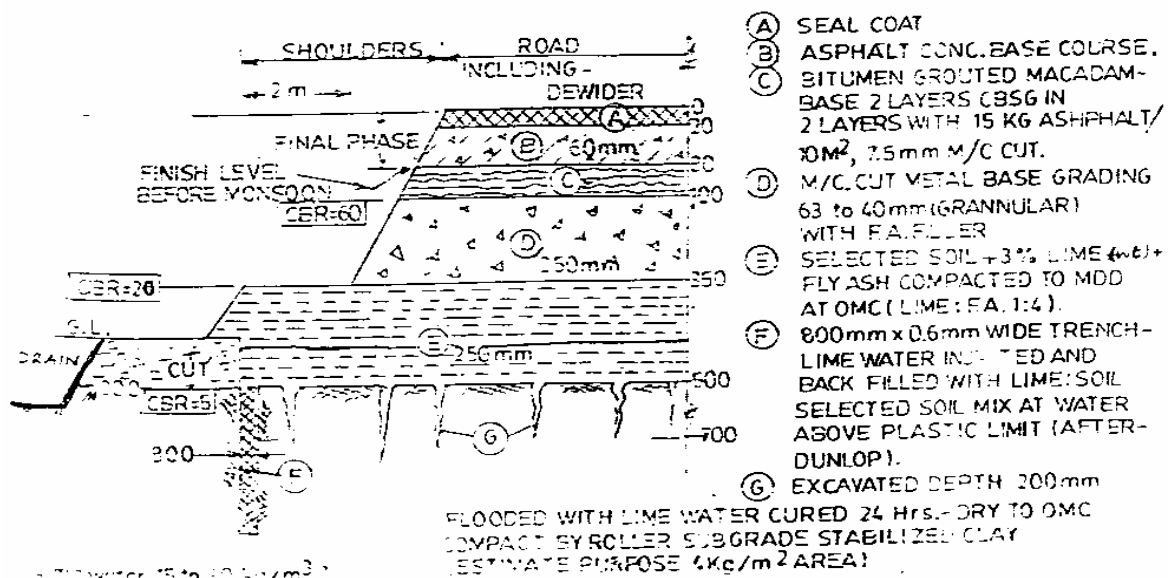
PAVEMENT DESIGN FOR ROAD BROADACH (WRITTERS DESIGN)
